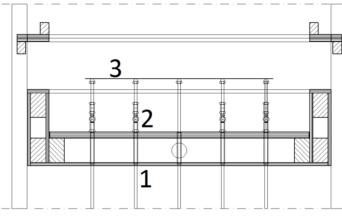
Technical drawing of construction & Figure 105b: Construction of the final mould
